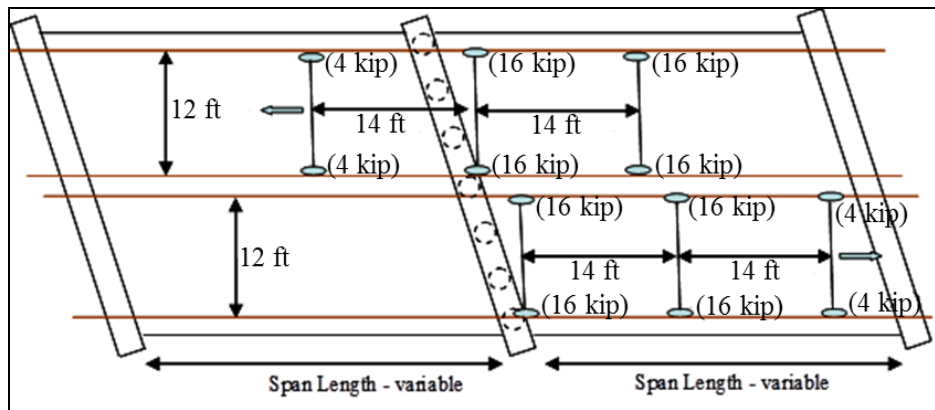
Plan of bridge deck with critical position of HS20-44 load.
